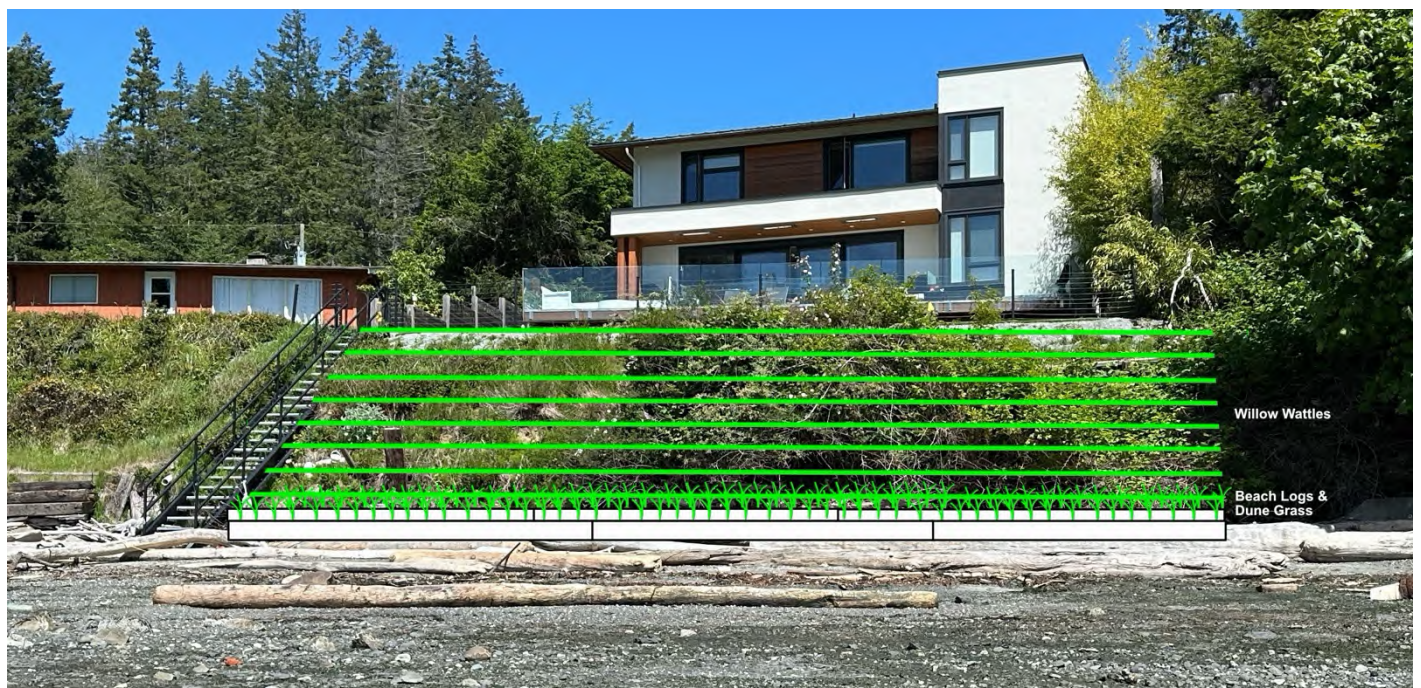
Proposed Green Shores/Bioengineering stabilization work on the shoreline slope at 37149 Schooner Way.
